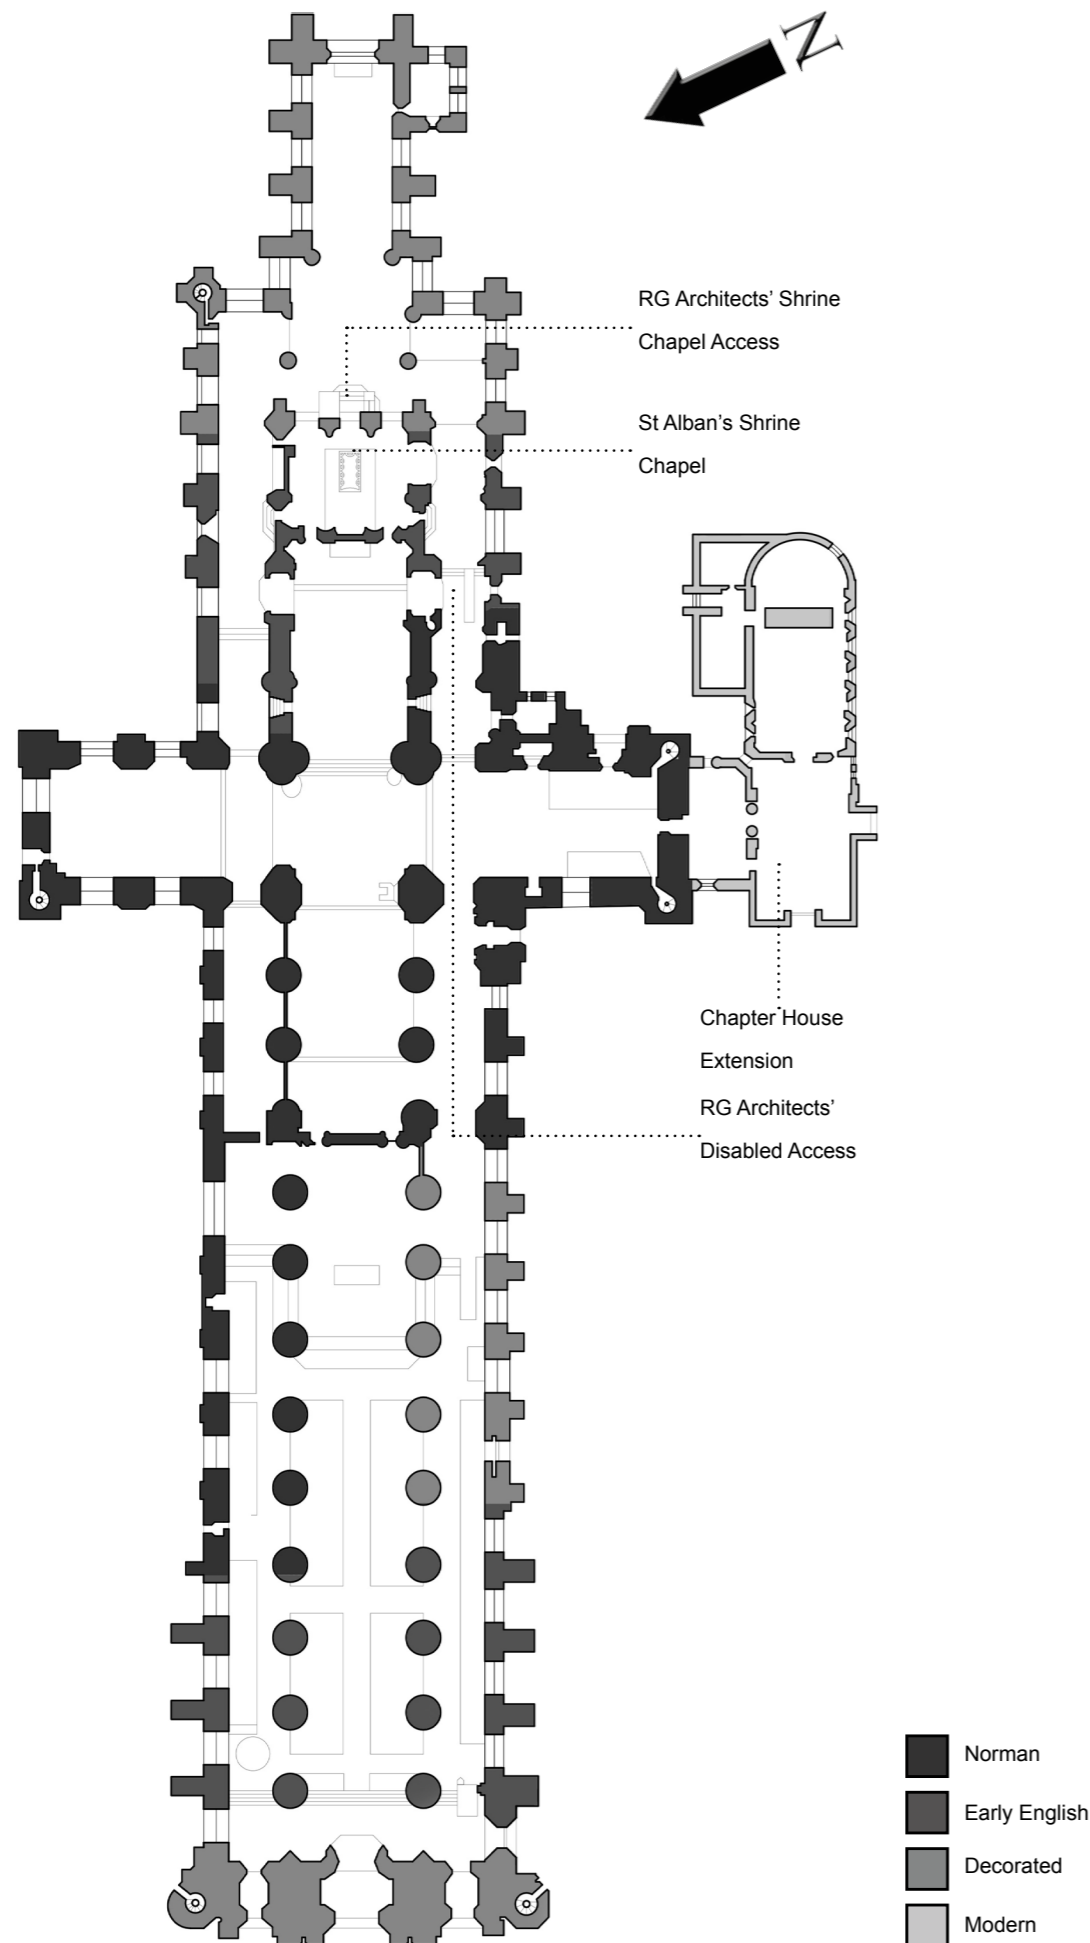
Ground floor plan indicating locations of restorations and adaptations in relation to text. This is an adaptation of St Albans Cathedral's own plan (<https://www.stalbanscathedral.org> and <http://www.antiquemapsandprints.com>)
